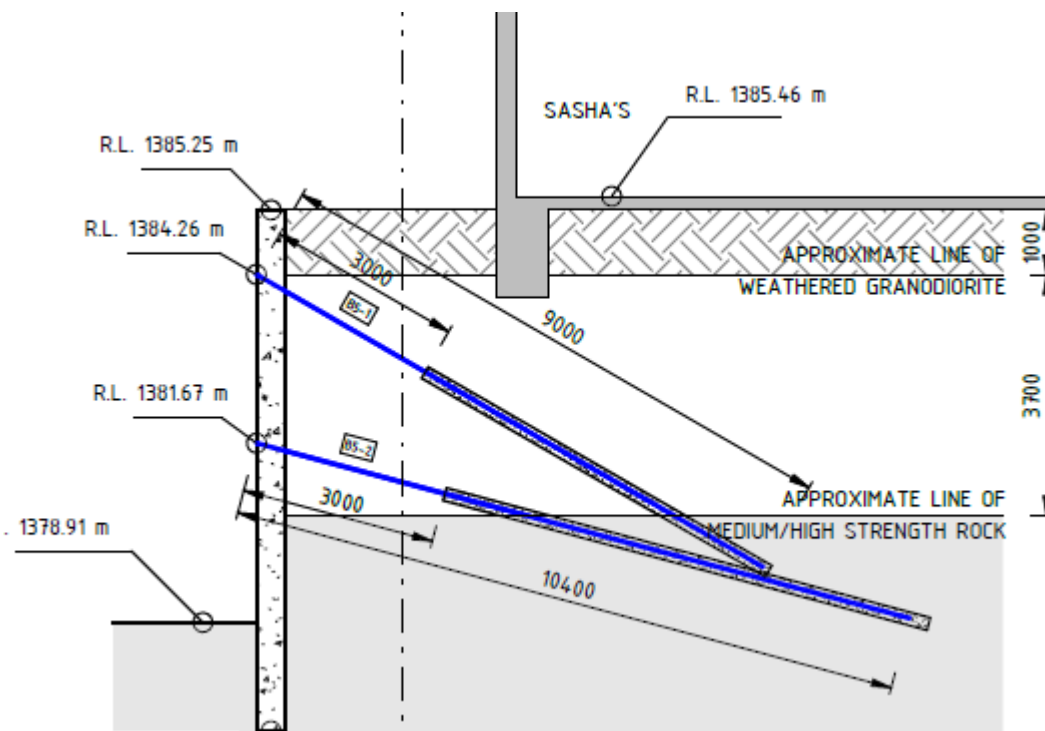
| Example of temporary ground anchor installed / to be installed from the site and under Sasha's Apartment (Source: Applicant documentation)
